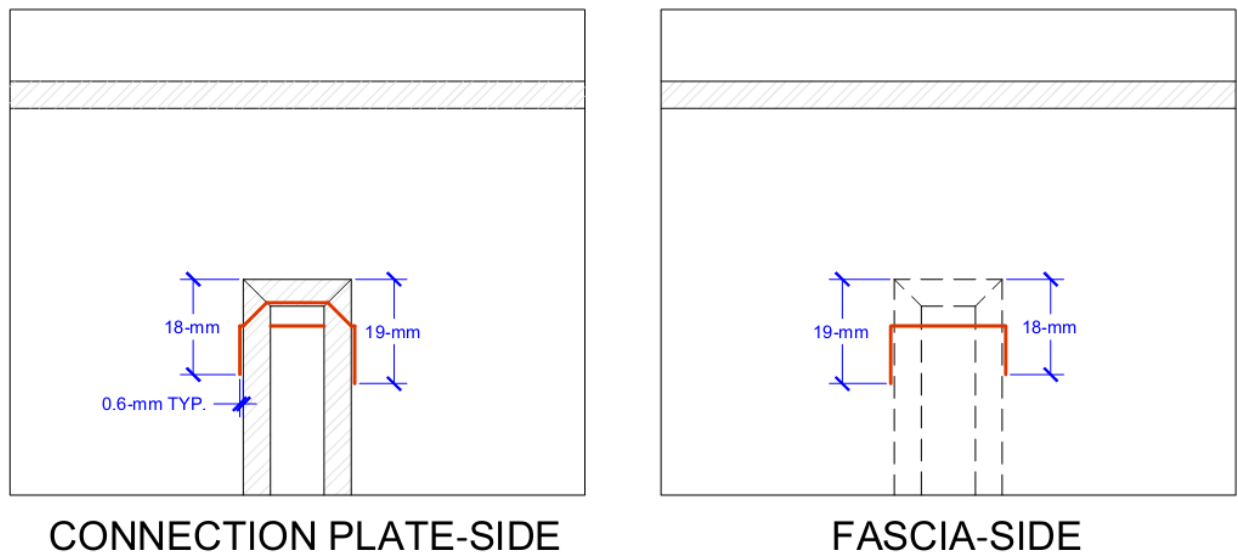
“Detailed Through-Thickness” modeling approach for cracks observed after 150,000 cycles on north girder
